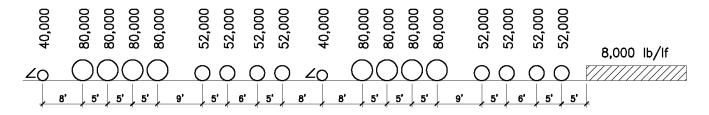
AREMA Cooper E80 Railway Loading
